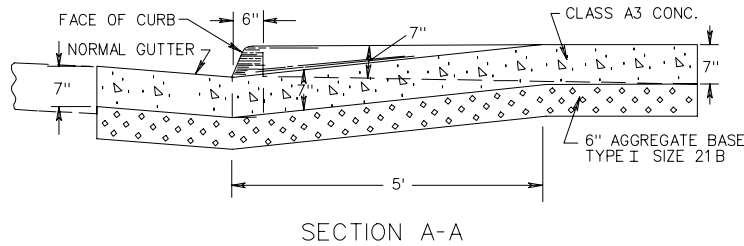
DETAIL TO BE USED WHEN THE COMBINED WIDTH OF UNPAVED SPACE AND SIDEWALK SPACE IS LESS THAN 7'.
